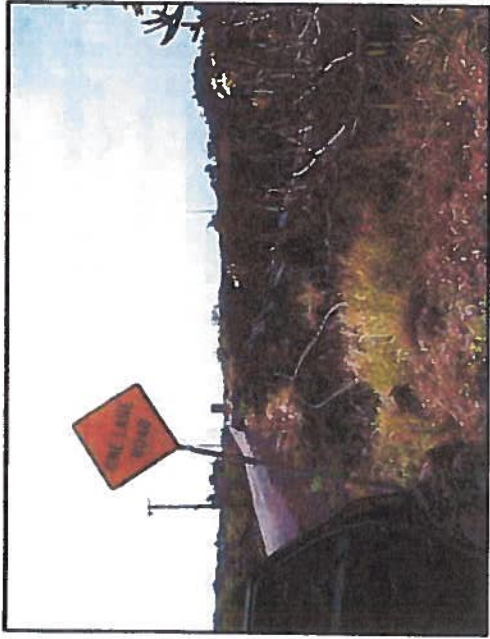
Existing 1-inch "Drisco" lines on Kamehameha Schools property, along Puuhonua Road, immediately south of Kahauloa Road.
